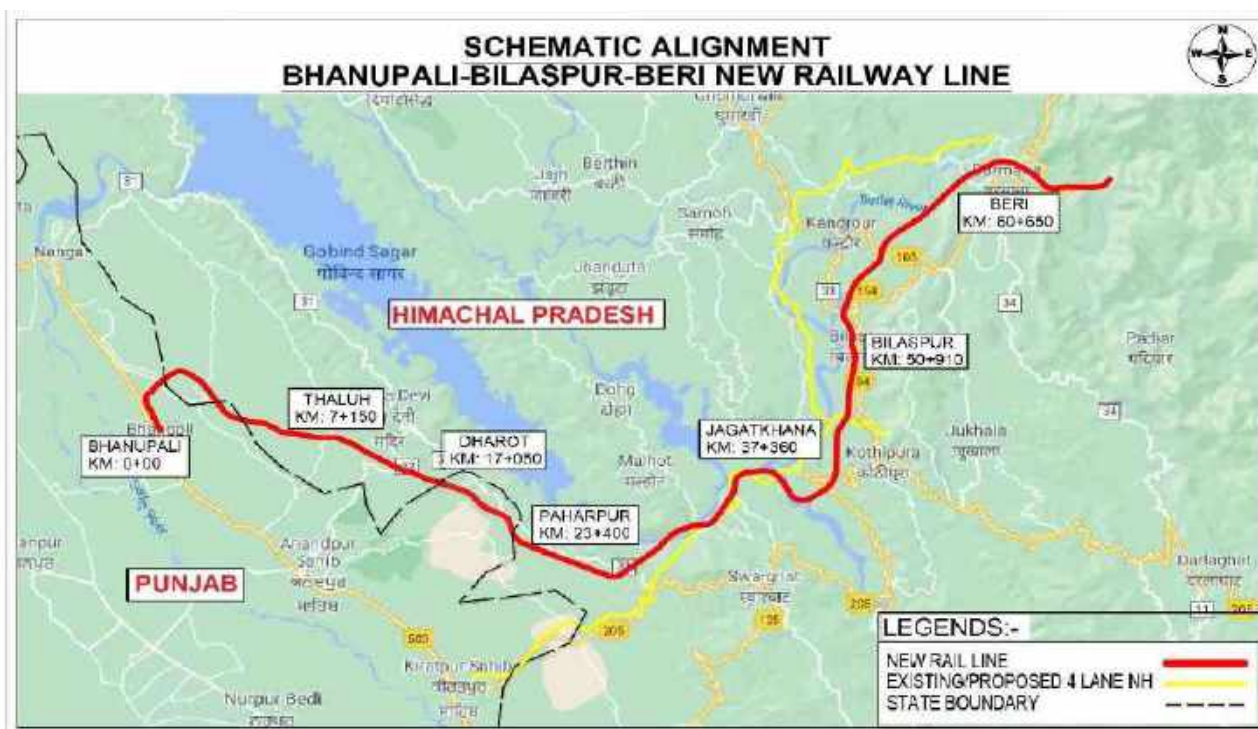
Schematic alignment of BBB railway line across Punjab and HP along with the proposed 4 lane highway and state boundary
